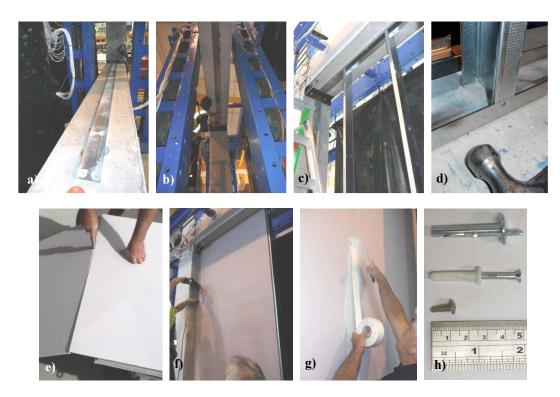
Construction sequence for the steel framed drywall FIF1-STFD, a-b) Top & bottom track installation, c-d) Stud installation into tracks, e-f) Gypsum lining installation, g) Plastering, h) Anchors/fasteners used
